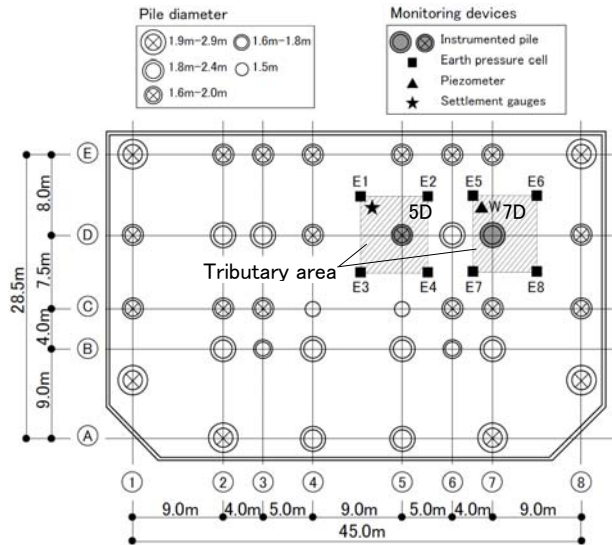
Foundation plan with layout of piles (Yamashita et al., 2011a)
